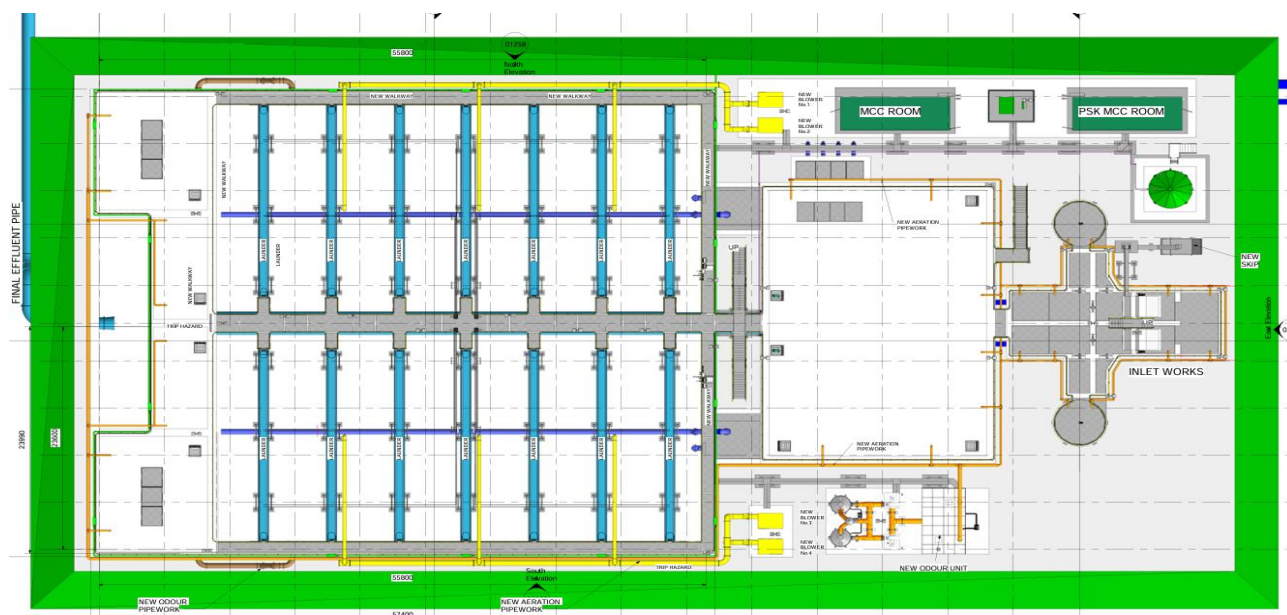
PROPOSED NEW INLET WORKS & AGS TANK PLAN
